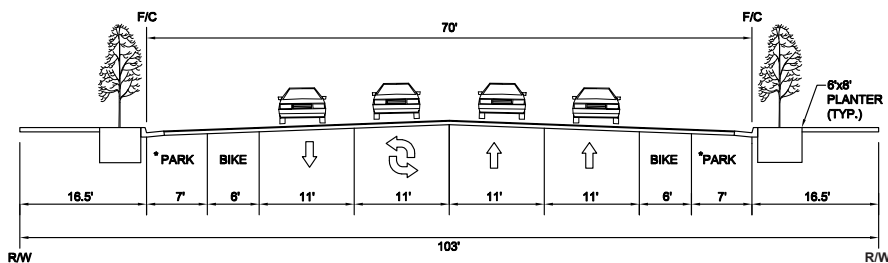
Railyards Boulevard - west of 7th Street (looking west)
